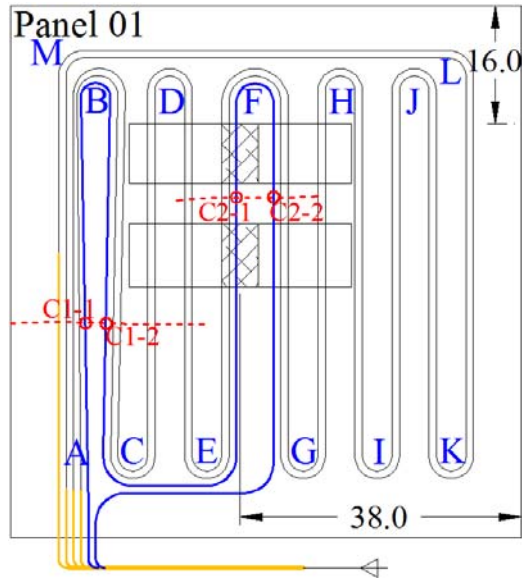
Cracks in P1 under the truck load P2S3.
